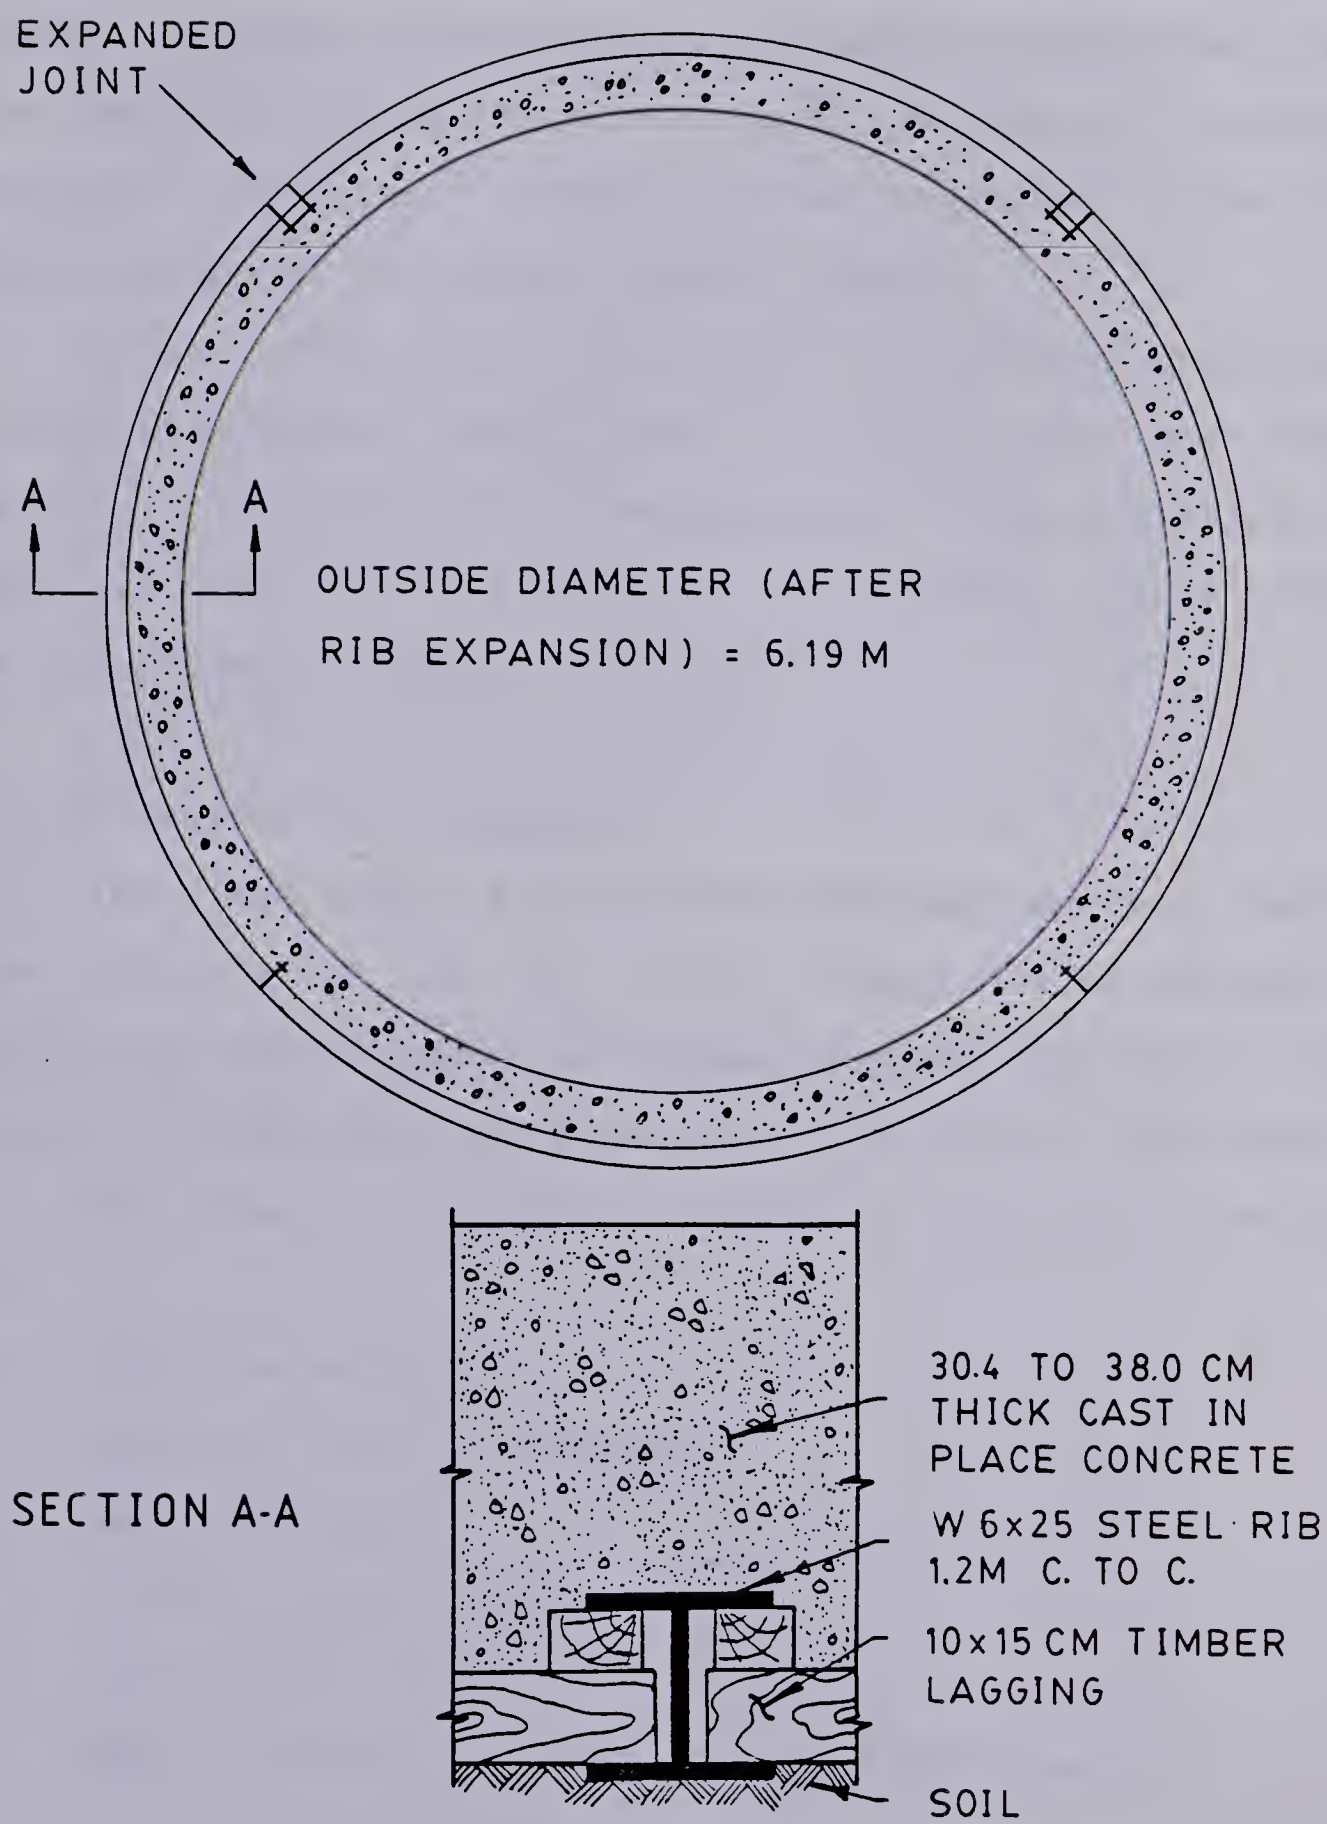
L.R.T. TUNNEL LINING SYSTEM
